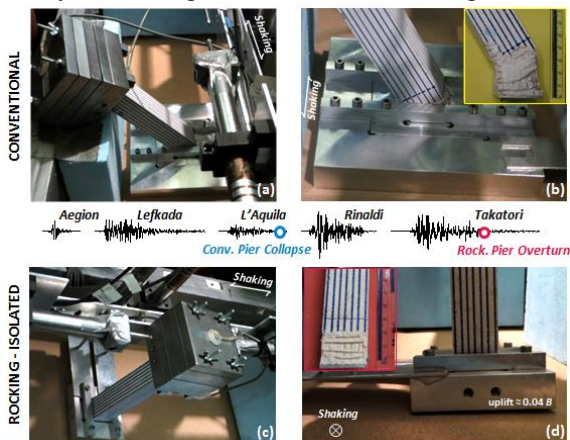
Photos of bridge models (a) the conventional pier having failed after shaking and (b) closer view of its column base and foundation; (c) the rocking pier after shaking plus two additional strong motions and (d) its foundation (Loli et al. 2014).
